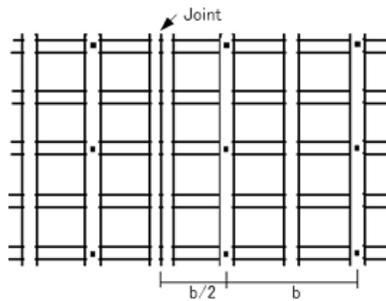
Sketches of composite frame with vertical joint for slope protection.
